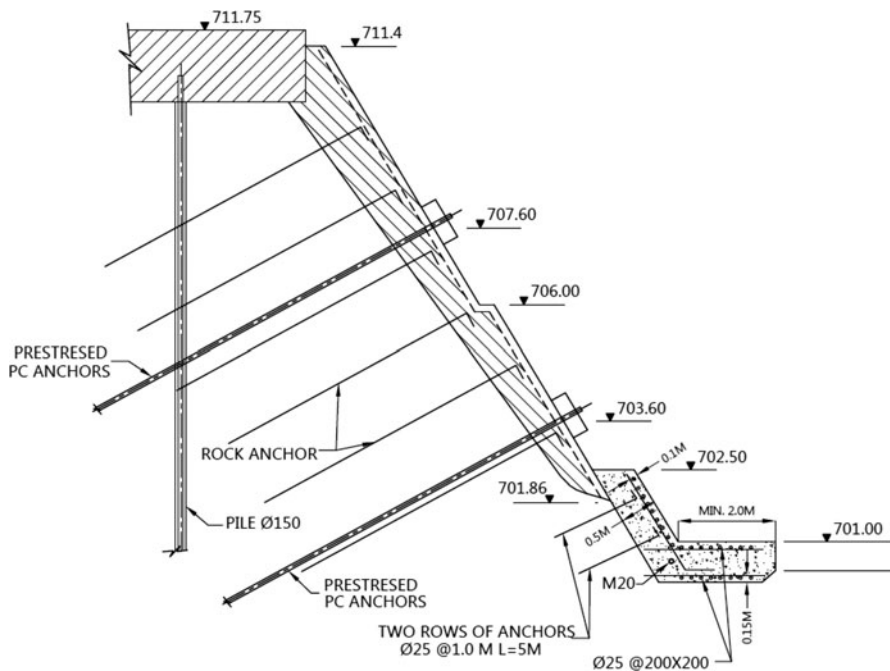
Slope treatment of intake area (typical section between benches).
